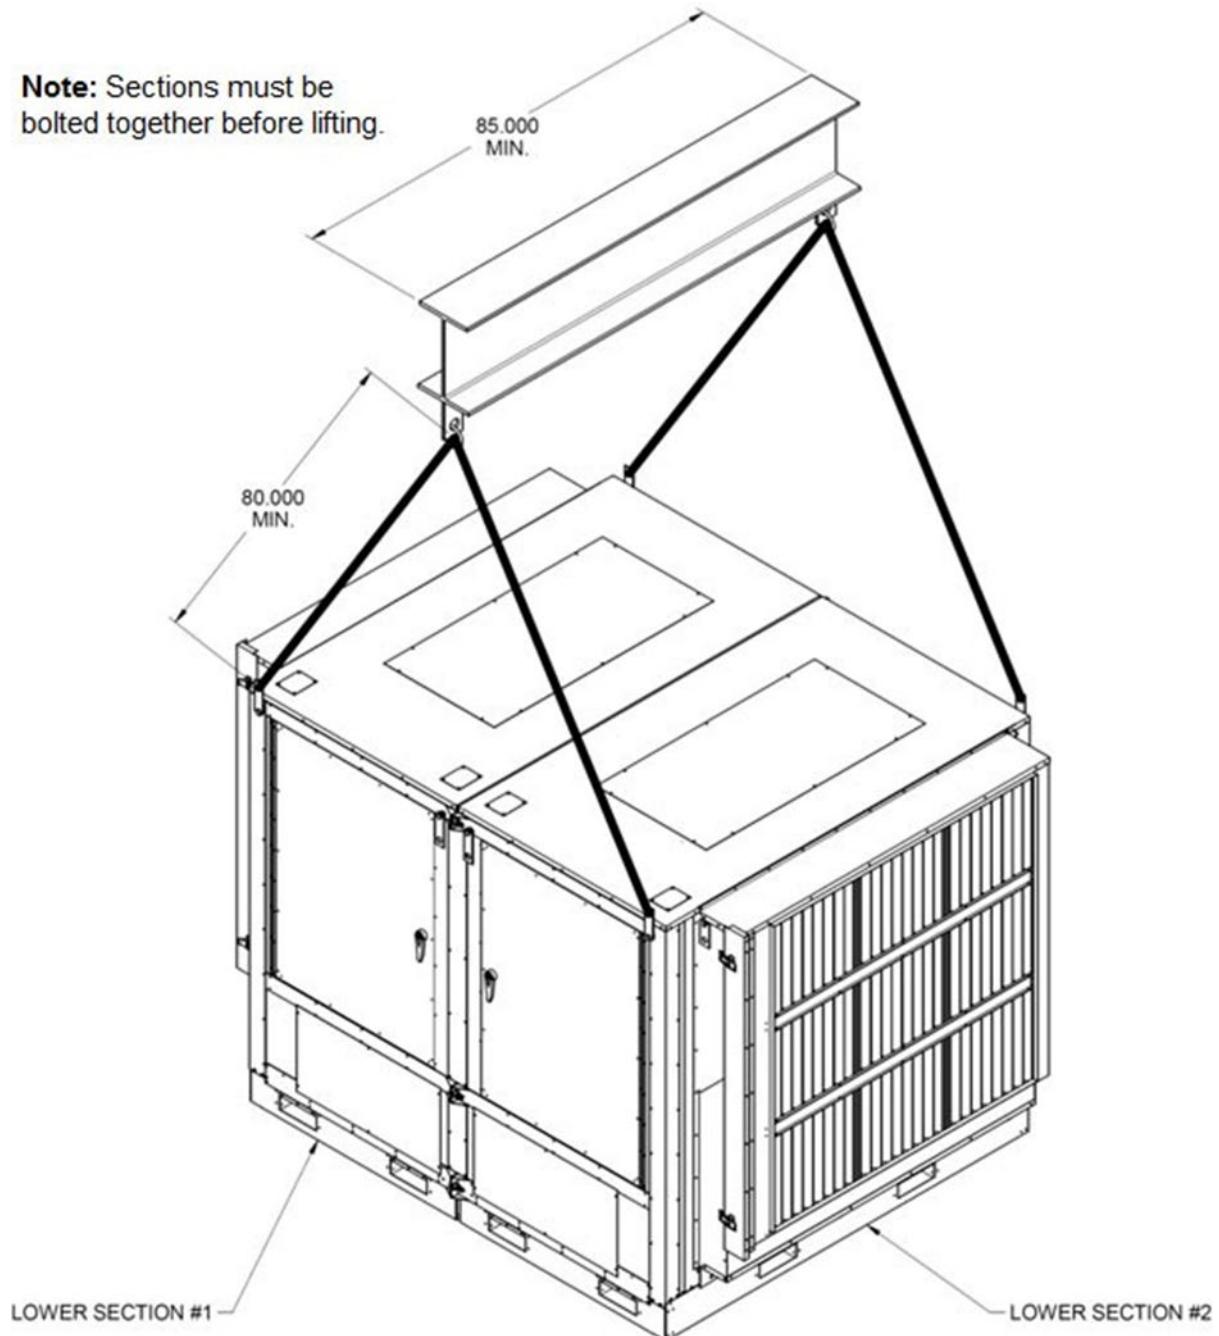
Two Piece Dual Unit Coil Section Lifting Details
